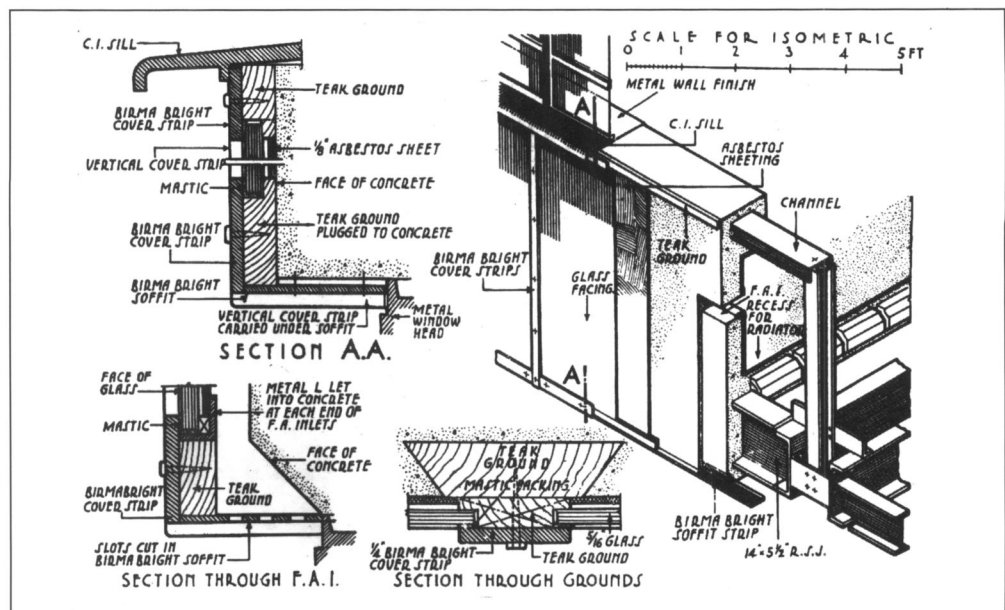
Details of the glass cladding of Universal House, London, by Joseph Emberton (from *Building*, 1935).
